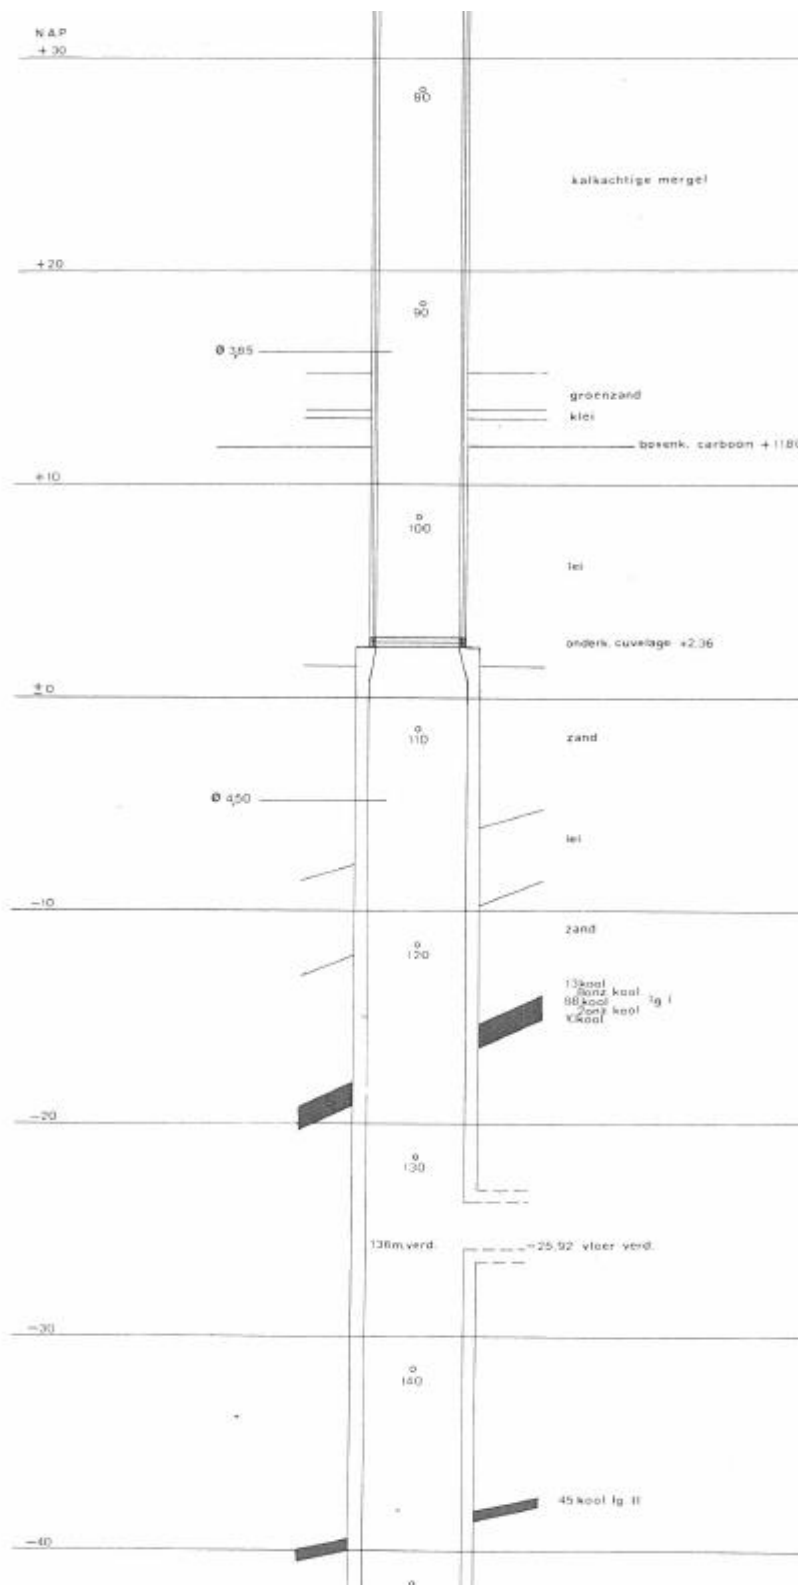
Strata shaft III, ON I, 136 m floor /35/
